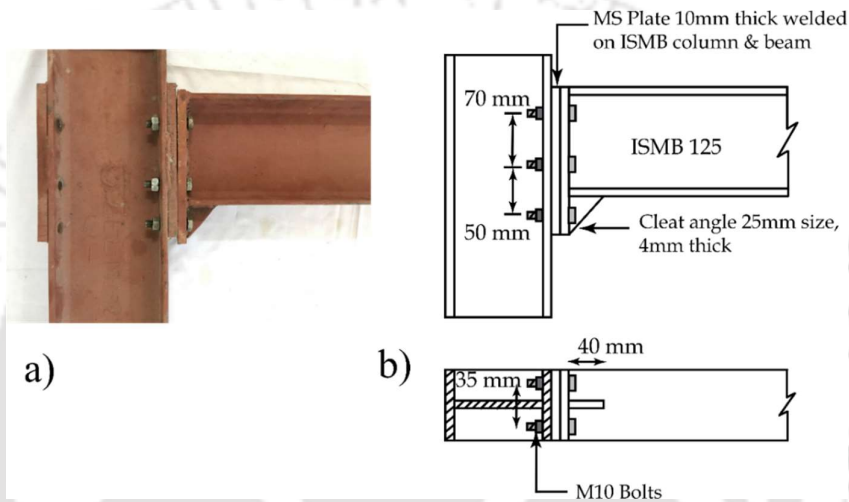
(a) Enhanced image of the moment connection of “SMRF” and; (b) schematic structural detailing of the beam-to-column connection
